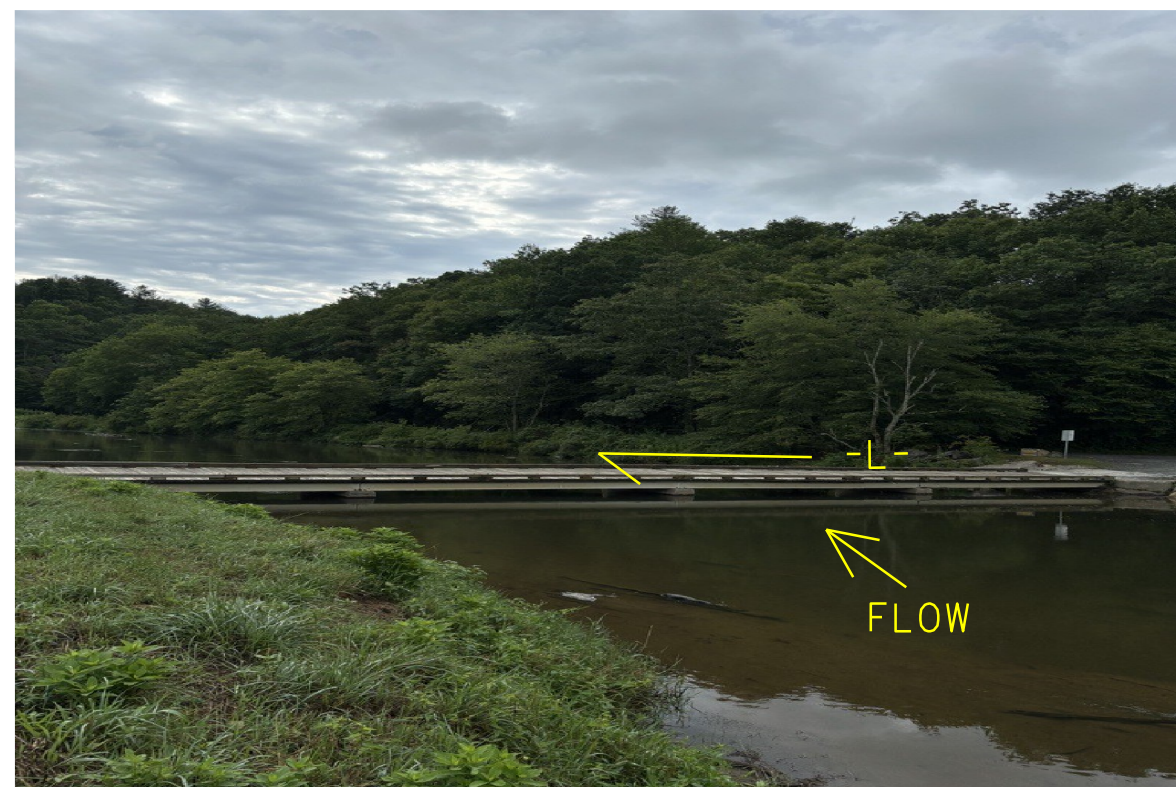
UPSTREAM OF EXISTING BRIDGE.
